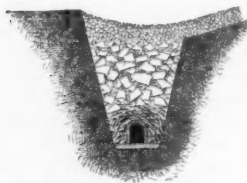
CROSS-SECTION OF FILLED DRAIN WITH TILE BOTTOM.
